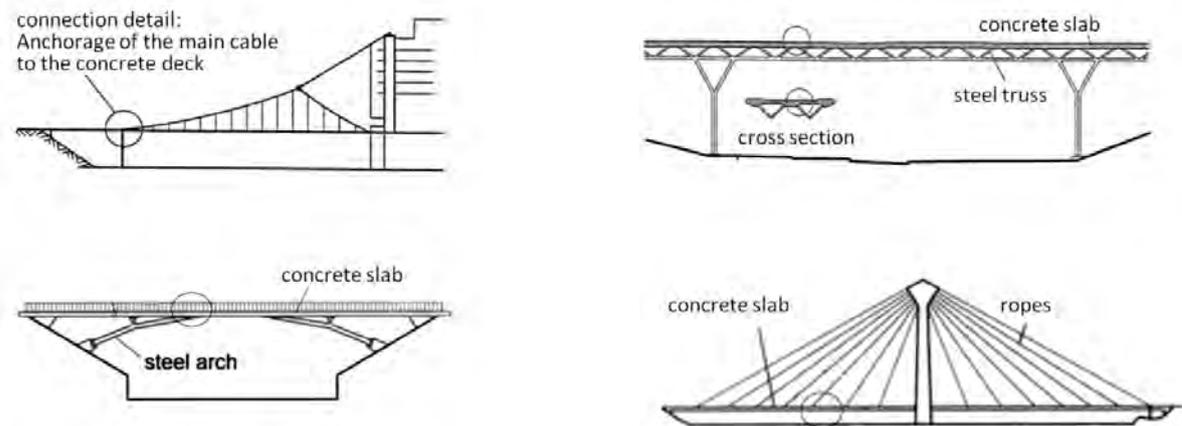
Examples for the application of saw tooth connectors in bridge design
